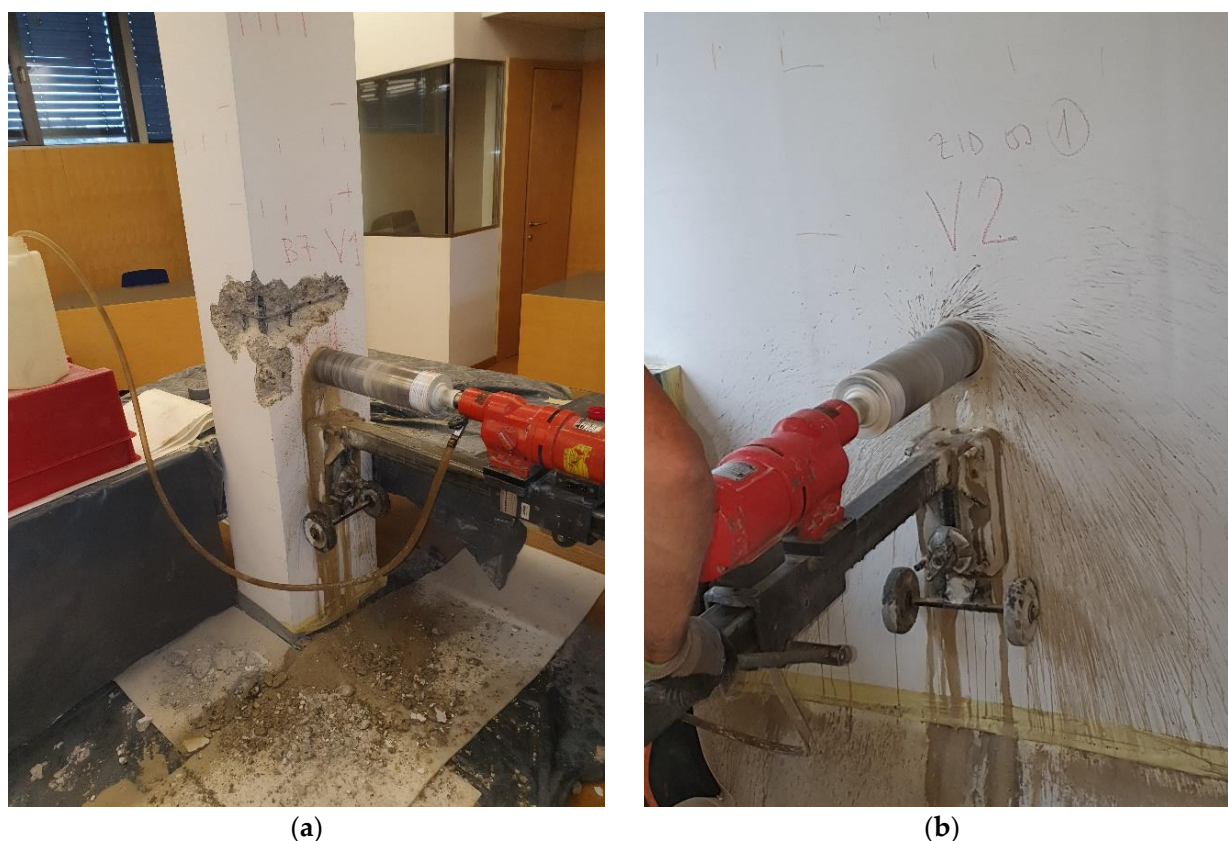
Extracting concrete samples in the column on the ground floor (a) and a wall on the 2nd floor (b).
